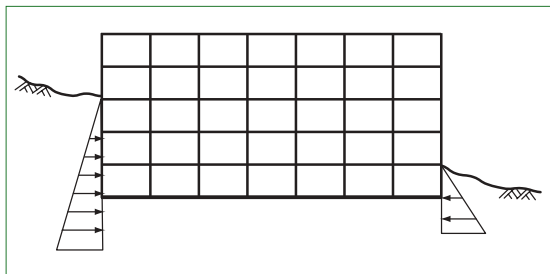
Permanent horizontal loads from earth pressure on sloping site
